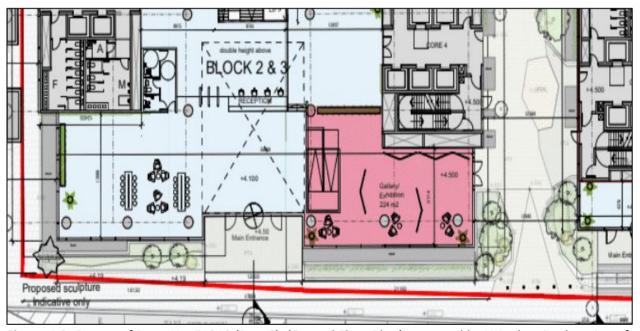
Extract of Dwg. No. Z1010 (Rev. 6), 'Ground Floor Plan', prepared by HJL, showing location of gallery / exhibition space at North Wall Quay. Cropped by TPA, January 2021. This drawing is included as Appendix D in the Waterfront South Central – SHD Proposal – Assorted Appendices, prepared by TPA and dated Thursday, 28 January 2021.
